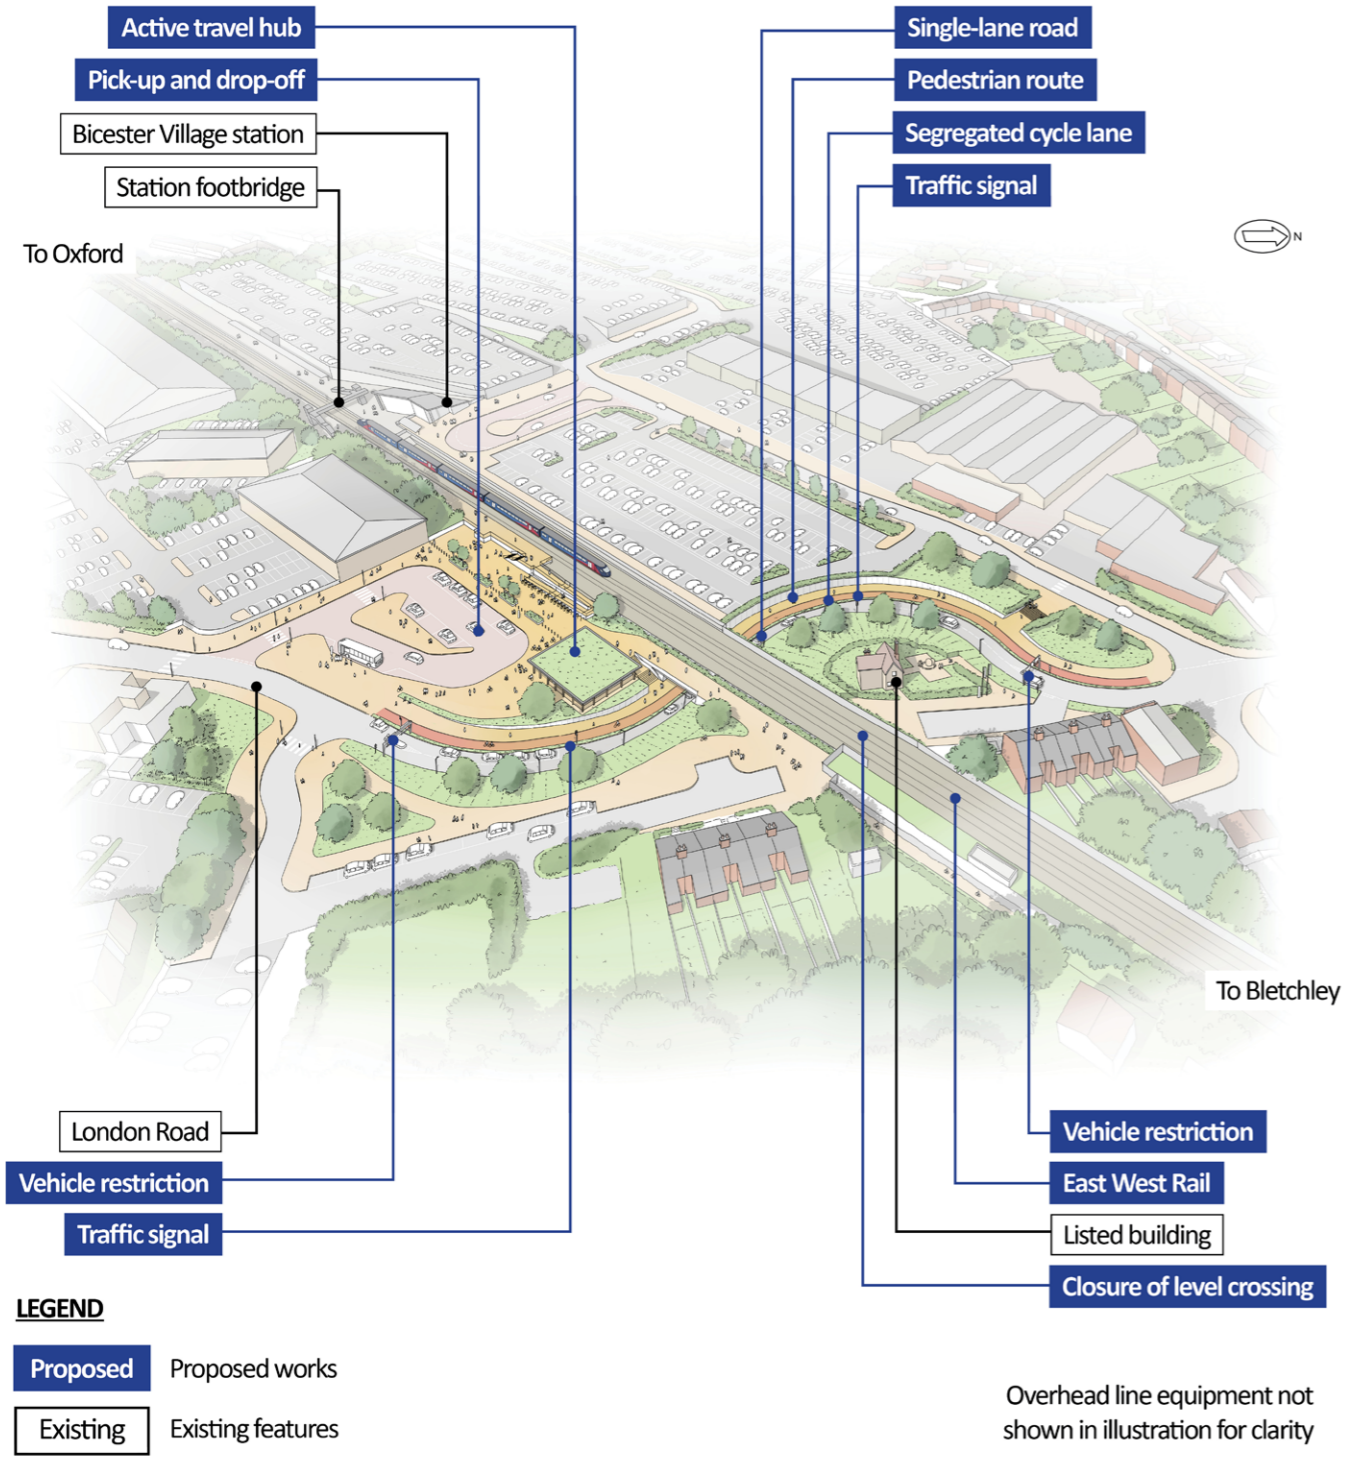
An indicative illustration of the underpass at London Road, Bicester looking north-west towards the railway line
